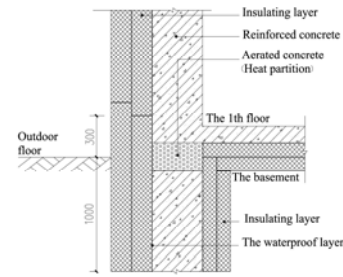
FIGURE IV. CONSTRUCTION OF NON-HEATING BASEMENT ROOF AND EXTERNAL WALL INSULATION JOINTS
